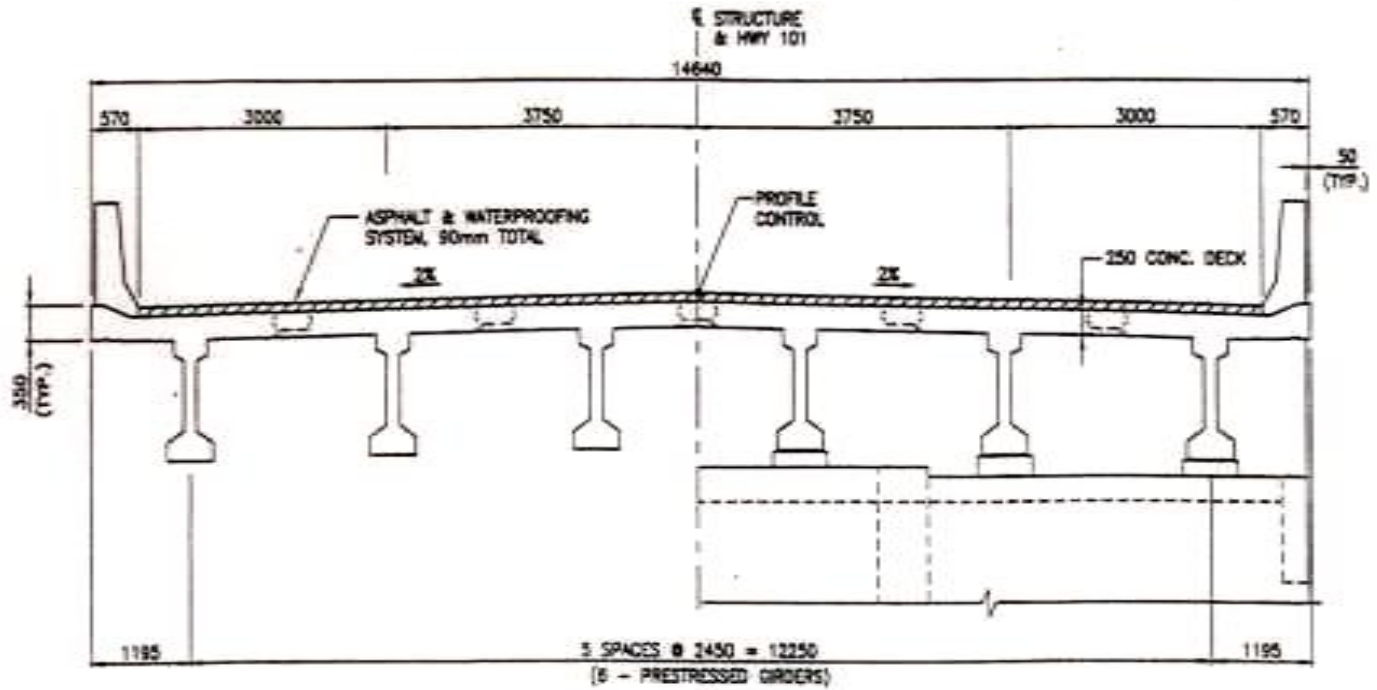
Cross section of the Moose Creek Bridge
